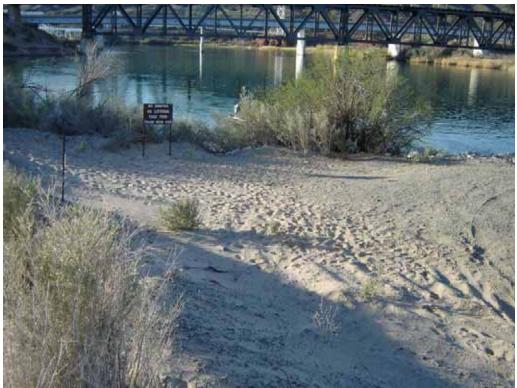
Pre-Construction: Viewing south from the east side of the Site-1 (MW-54) work area.
